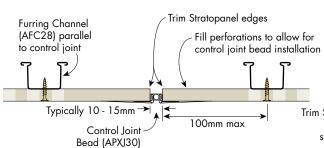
Control Joint - Control Joint Bead Parallel to furring channel
